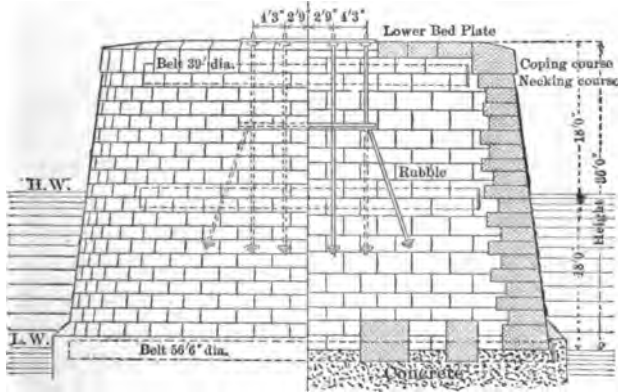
CIRCULAR GRANITE PIER AS FOUNDED BY COFFER-DAM, FORTH BRIDGE.
